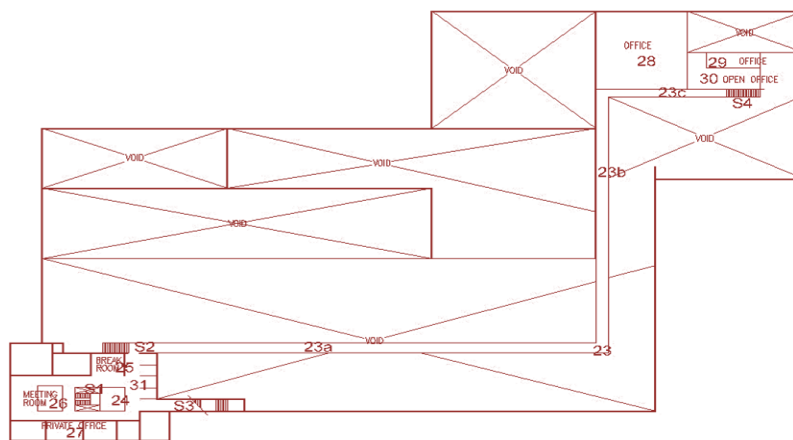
First floor plan of Food Bank, drawn based on images retrieved from auworkshop.com
